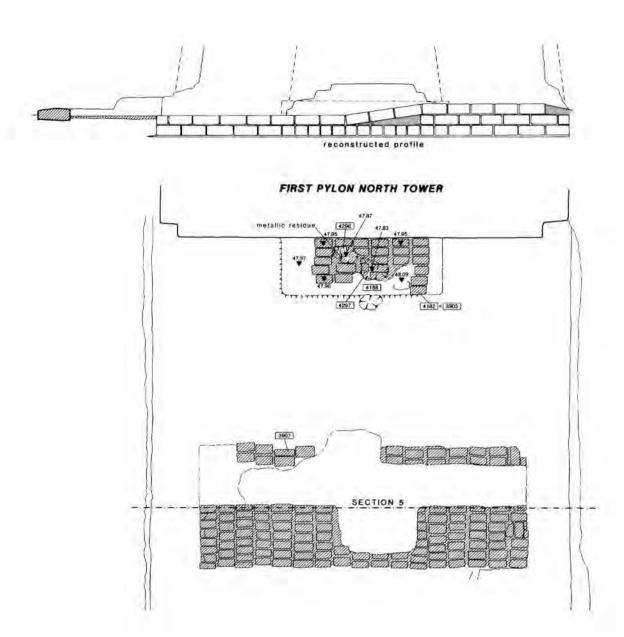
Plan of Phase II brickwork in the gateway, underlying the plan of Figure 6.12, and elevation of the south face of the north pylon, with restored section of the stonework which would have lain in front.
